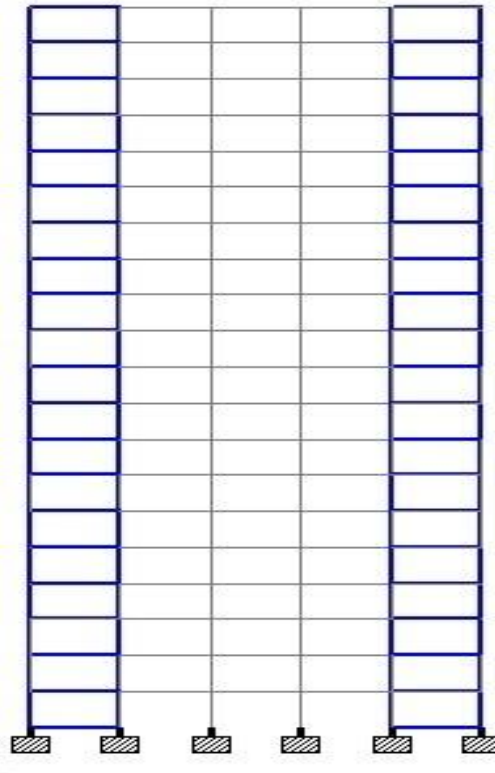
Fig.IV Type C- Elevation of G+19 Building With Shear Wall.
